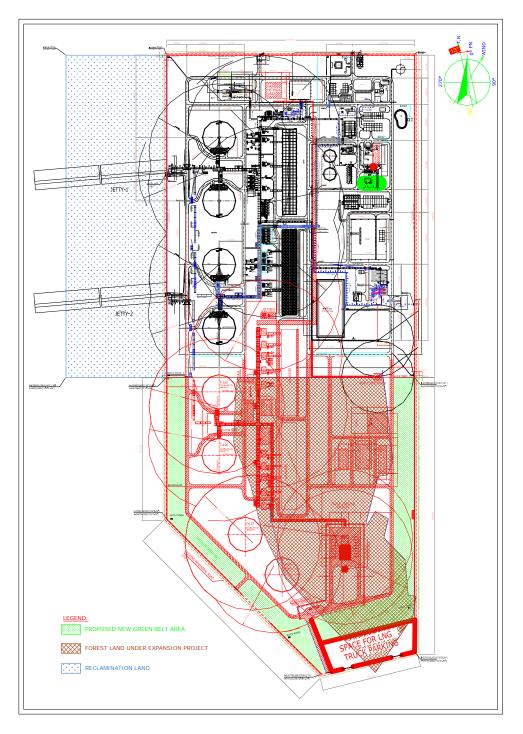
PROPOSED EXPANSION OF LNG FACILITY - SITE MAP SHOWING FACILITIES
